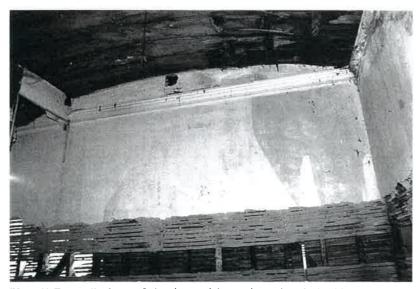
East wall of room I showing straight cornice and vaulted ceiling
